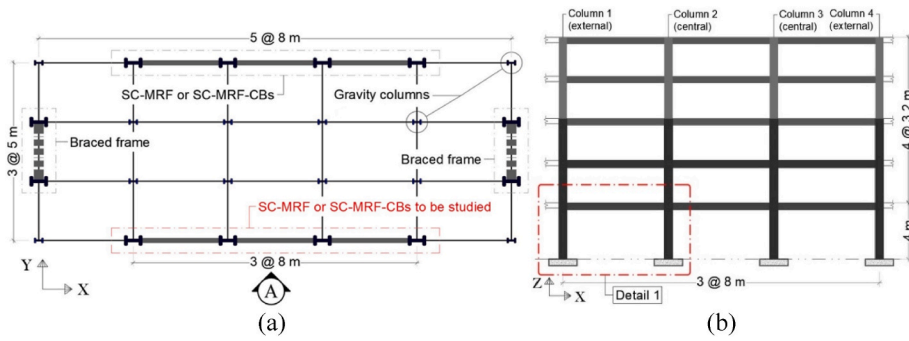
(a) Plan view; and (b) Elevation A of the prototype building.
